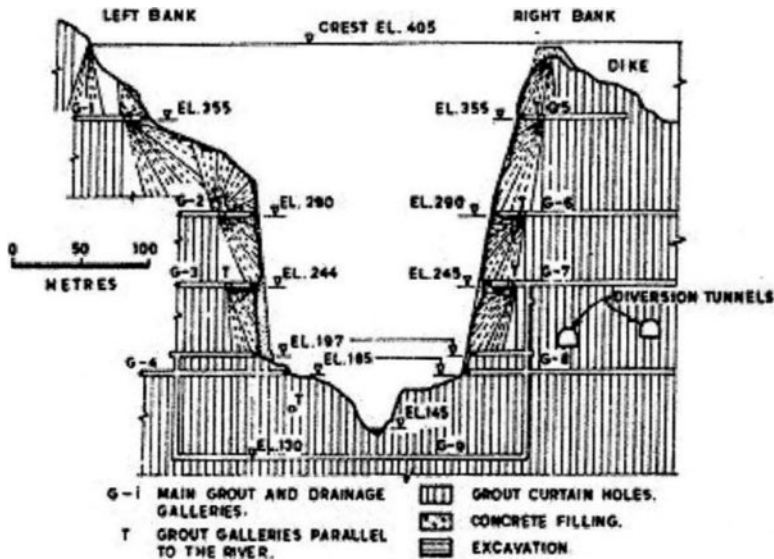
Longitudinal section along the axis of Chicoasen Dam showing reshaping of canyon walls and grouting and drainage galleries.
